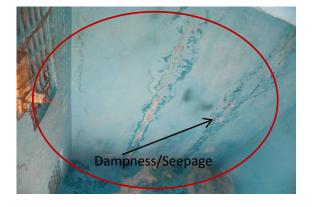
Dampness/Seapage on Wall No. 4 of Lobby, Toilet No. 2, Ground Floor
